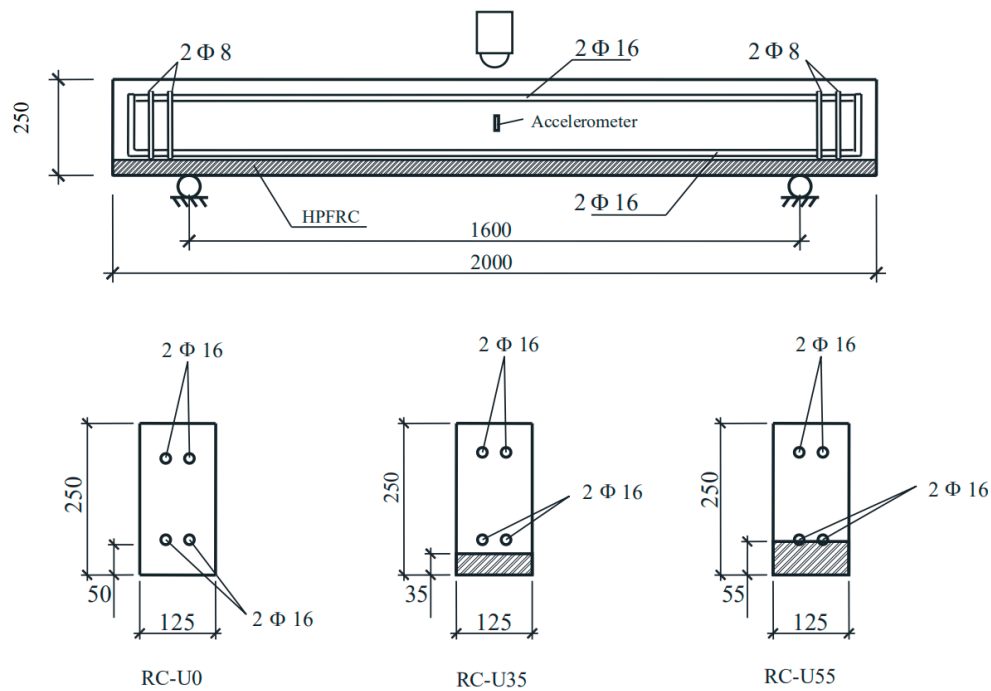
Test set-up and geometry of specimens (dimensions in mm).
